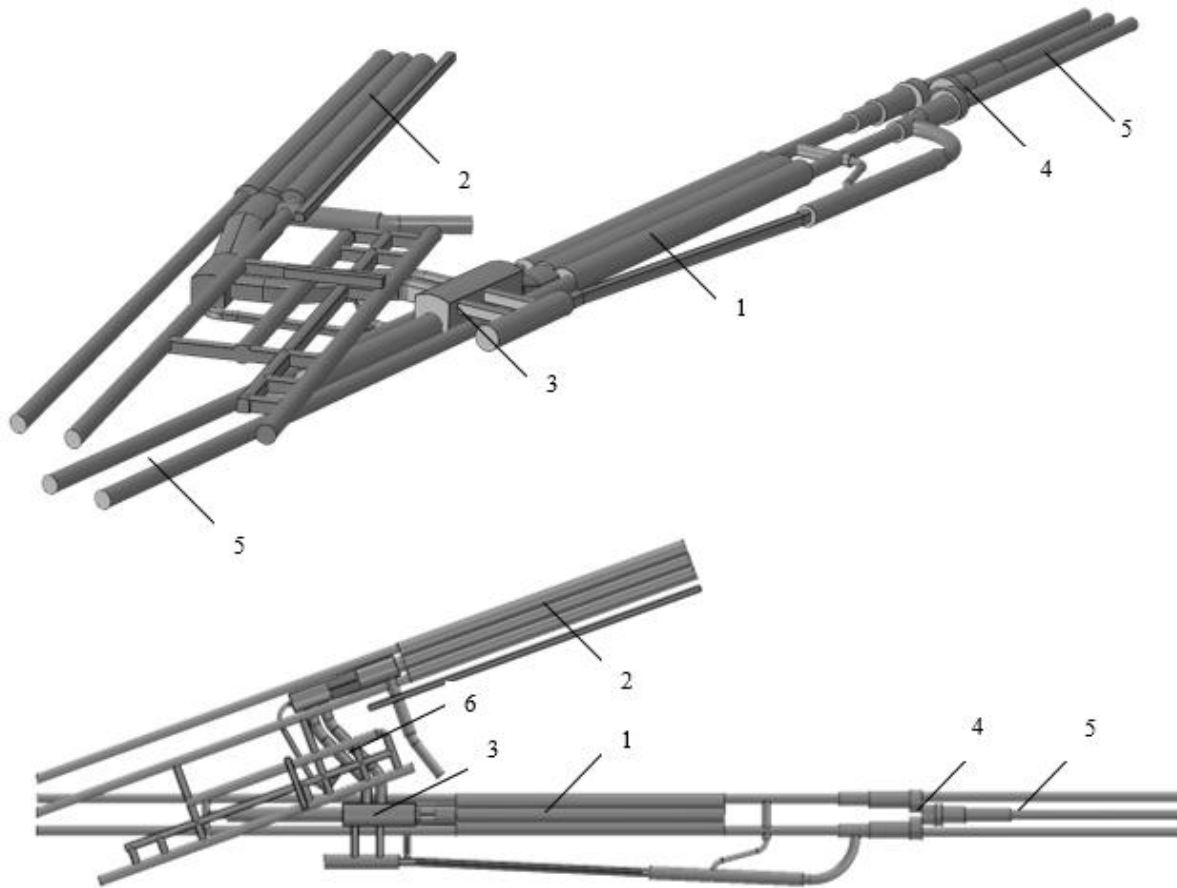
3D design concept of underground railway junction: 1 – underground station No. 1; 2 – underground station No. 2; 3 – transfer hub; 4 – junction tunnels; 5 – main line tunnels; 6 – pedestrian tunnels.
